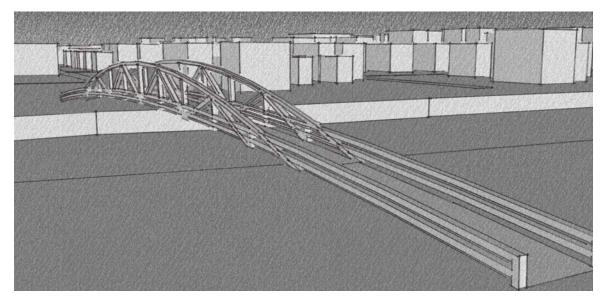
Pedestrian Bridge connecting Pioneer Park to Hovander Park
